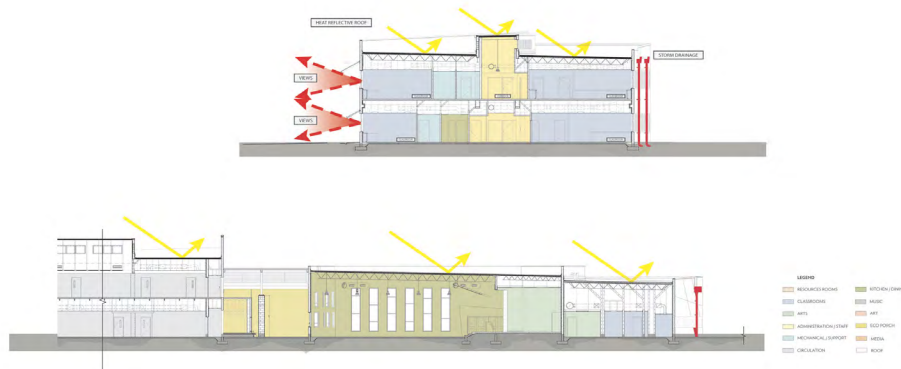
Section shows heat reflective roof and classroom views. Source: DesignShare, 2008.
